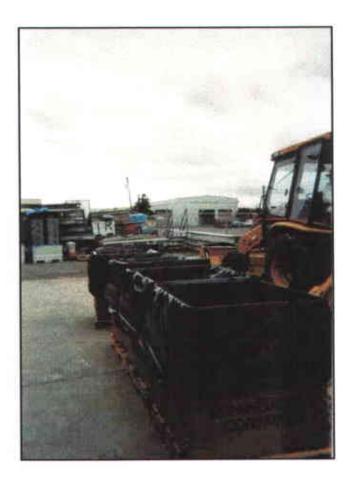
View looking east of tri-wall containers used for disposal of excavated soil.
